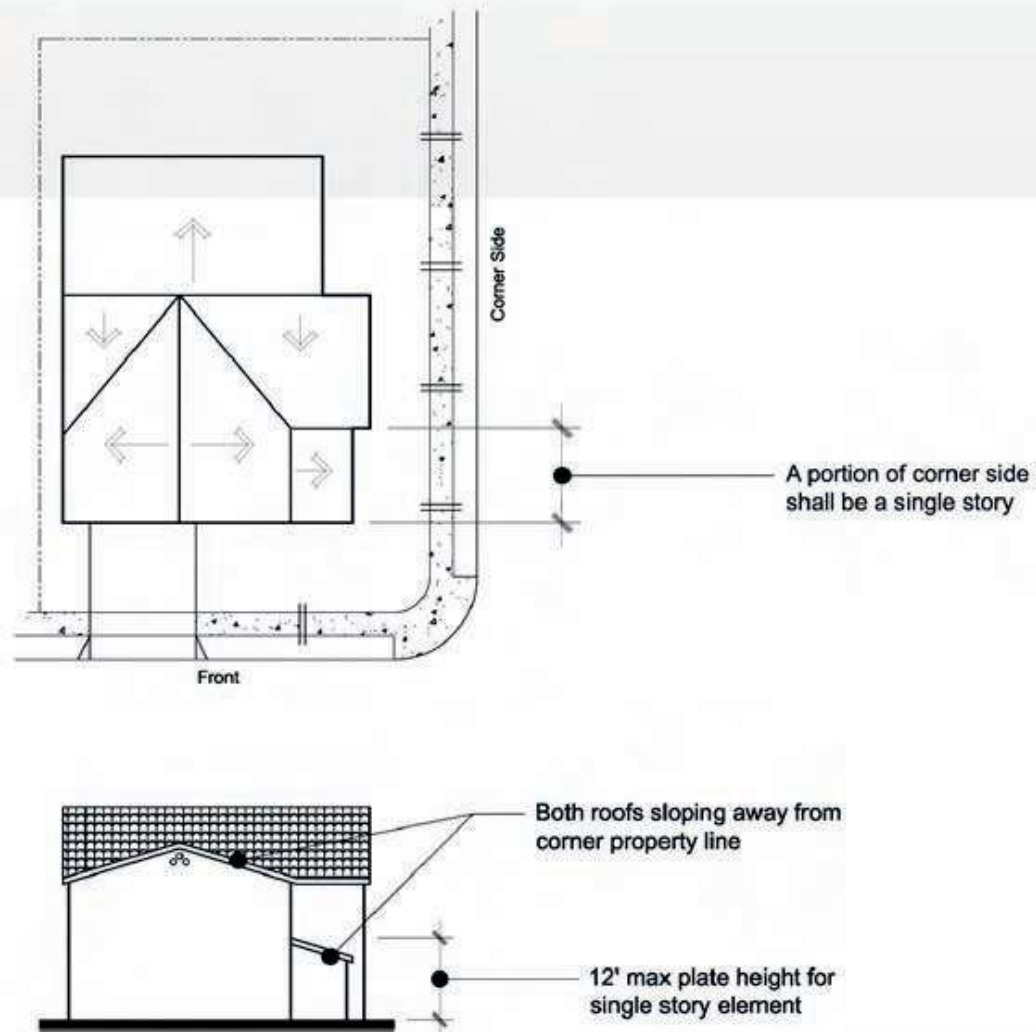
CORNER SIDE SINGLE STORY ARTICULATION
